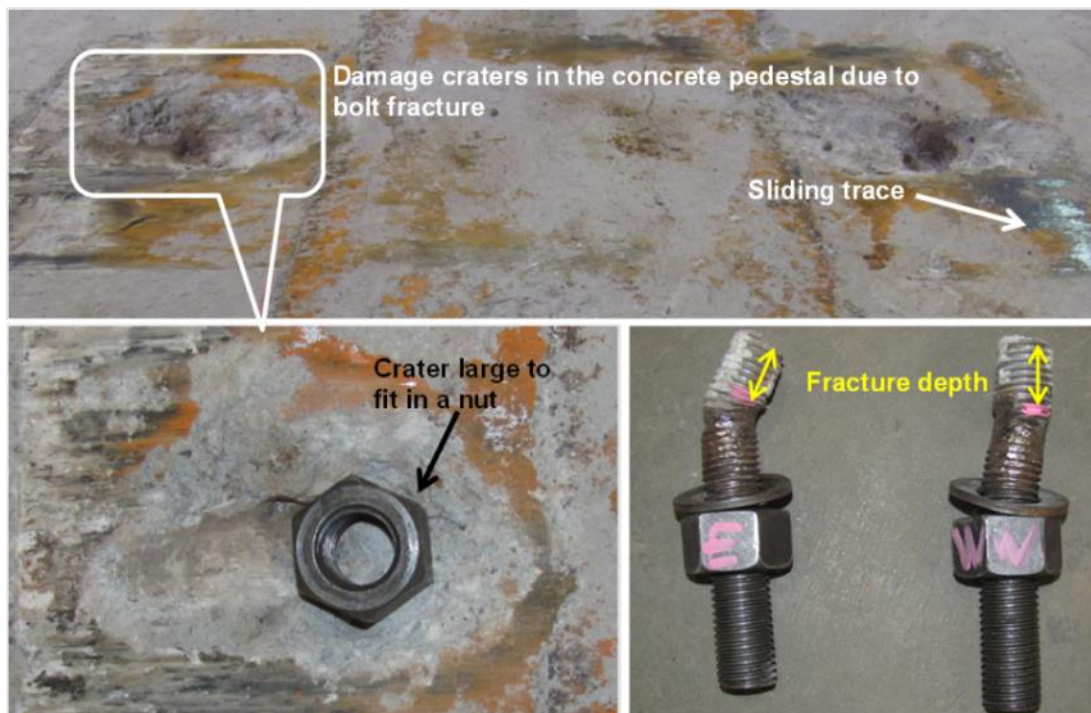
Photographs of the damaged concrete pedestal and anchor bolts due to bolt pullout and fracture
